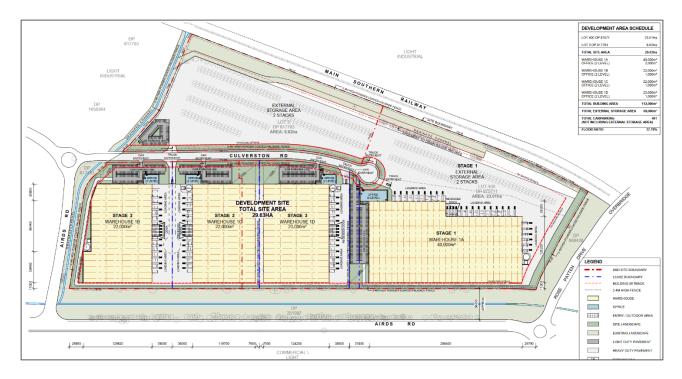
SSD-7500 Approved Architectural Site Plan (drawing 116101_A-SSD_A0006, issue 9, by Reid Campbell, dated 29/02/2017)
